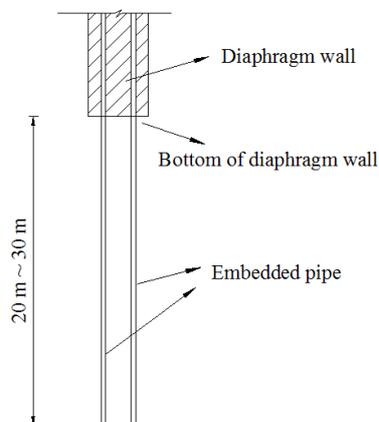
Vertical cross section of diaphragm wall with embedded grouting pipes
